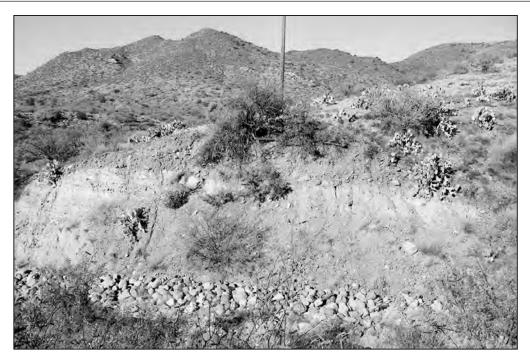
Roadcut 2 along Roadbed Segment 1, view west.
